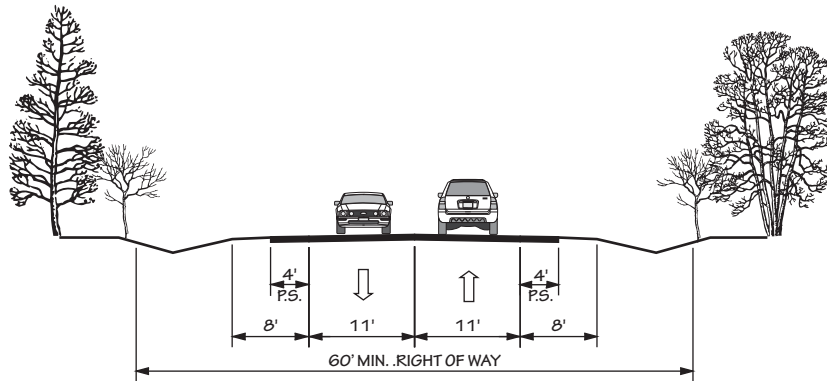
"TYPICAL" HIGHWAY CROSS SECTIONS
